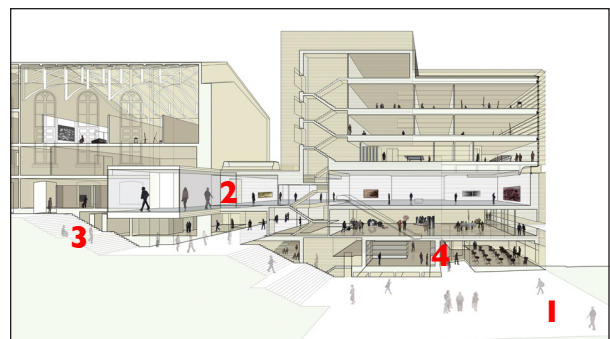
Section through Mem Hall (l) and Chace Center (r)
